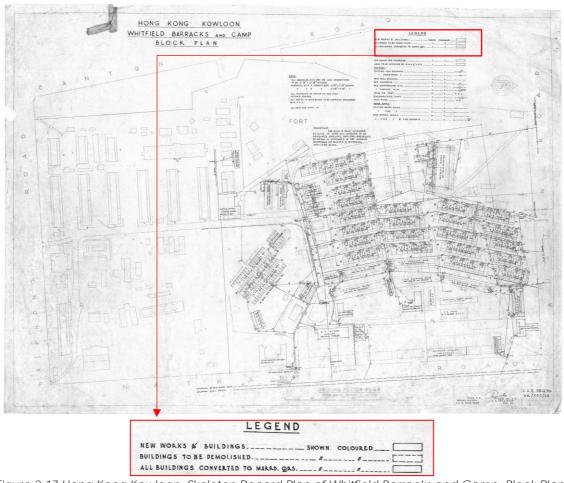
Hong Kong Kowloon, Skeleton Record Plan of Whitfield Barracks and Camp, Block Plan, 1948. Note that new works/ buildings, buildings to be demolished and buildings converted to Married Quarters were all buildings in the north portion. (Source: Public Records Office, File No. HKRS913-1-121)
